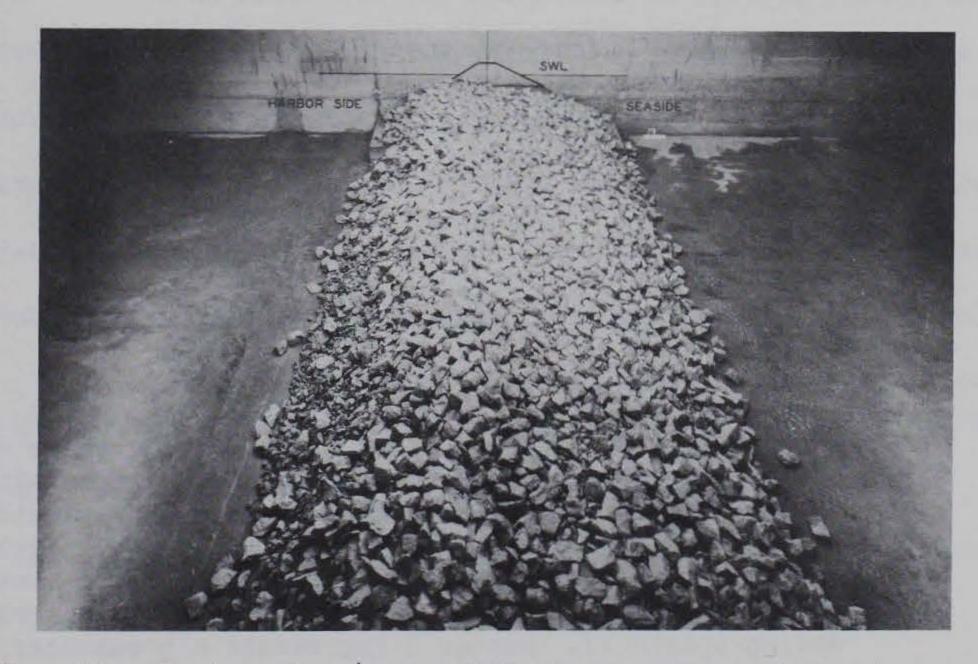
Test series 4, complete breakwater section after 21-ft wave attack, class A stone of crushed limestone
